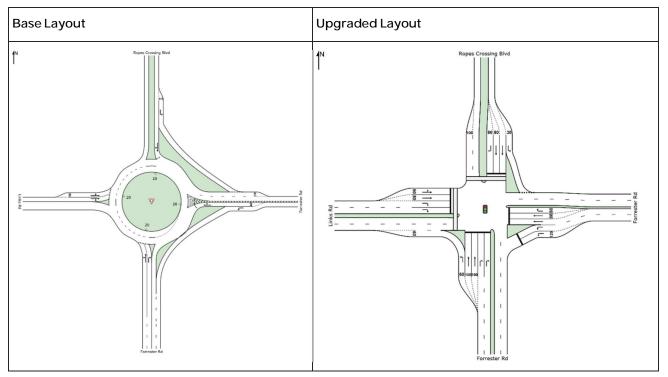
2026 with Links Road extension - Forrester Road/Ropes Crossing Boulevarde/Links Road
